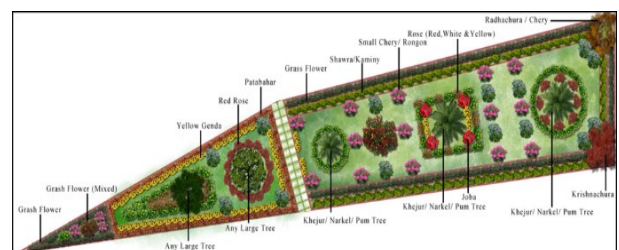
Plantation layout design by Ar. Md. Mahamudur Rahman Papon (2020-21)
